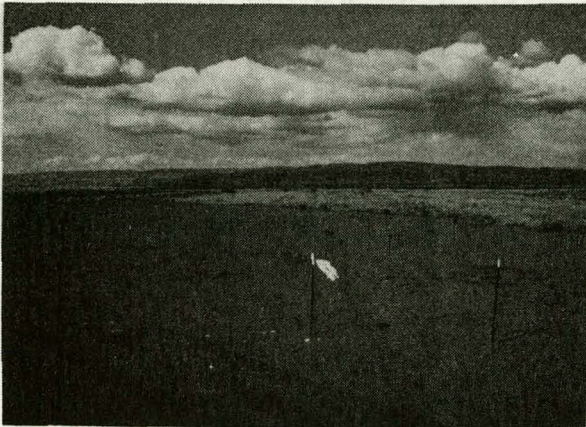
Staking Access Roads and Trenches in Burial Ground 218-E12A Prior to Installing Biobarriers
